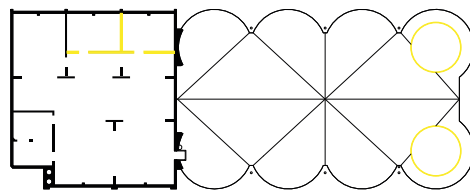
(appendix A). Floorplans of existing structure, scale 1:600.
